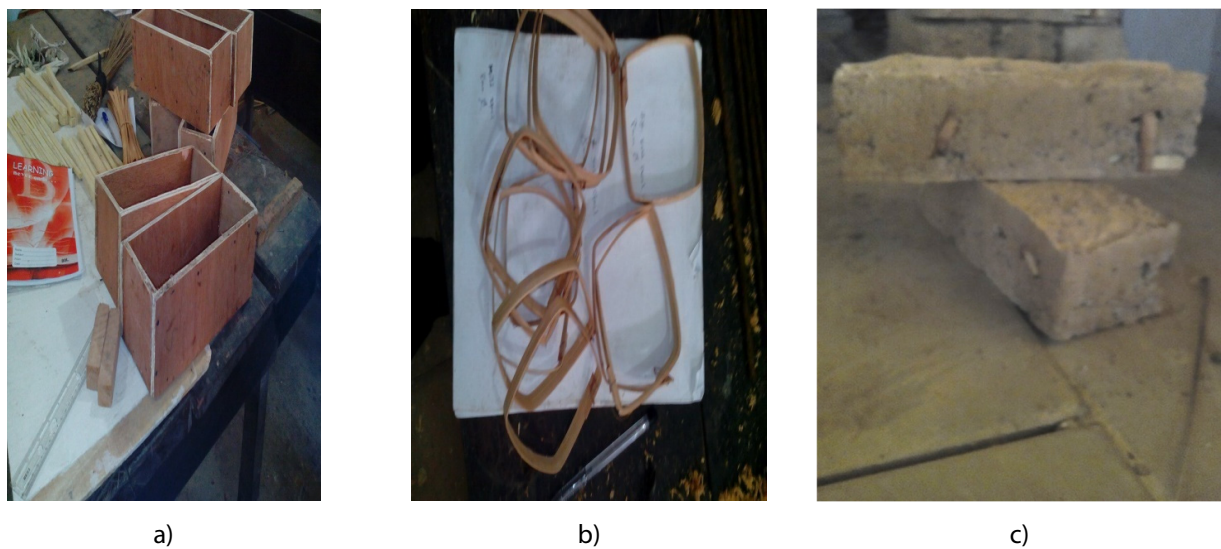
a) Planks for shuttering/form works, b) Stirrup in the form of a flexible wooden rod, c) Specimen samples
